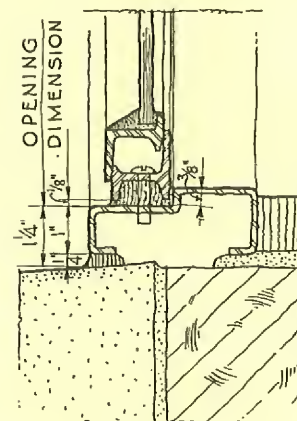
DETAILS SHOW ROLLED & PRESSED STEEL SUB-FRAMES IN CONNECTION WITH EQUAL LEG SASH FRAME SECTION
